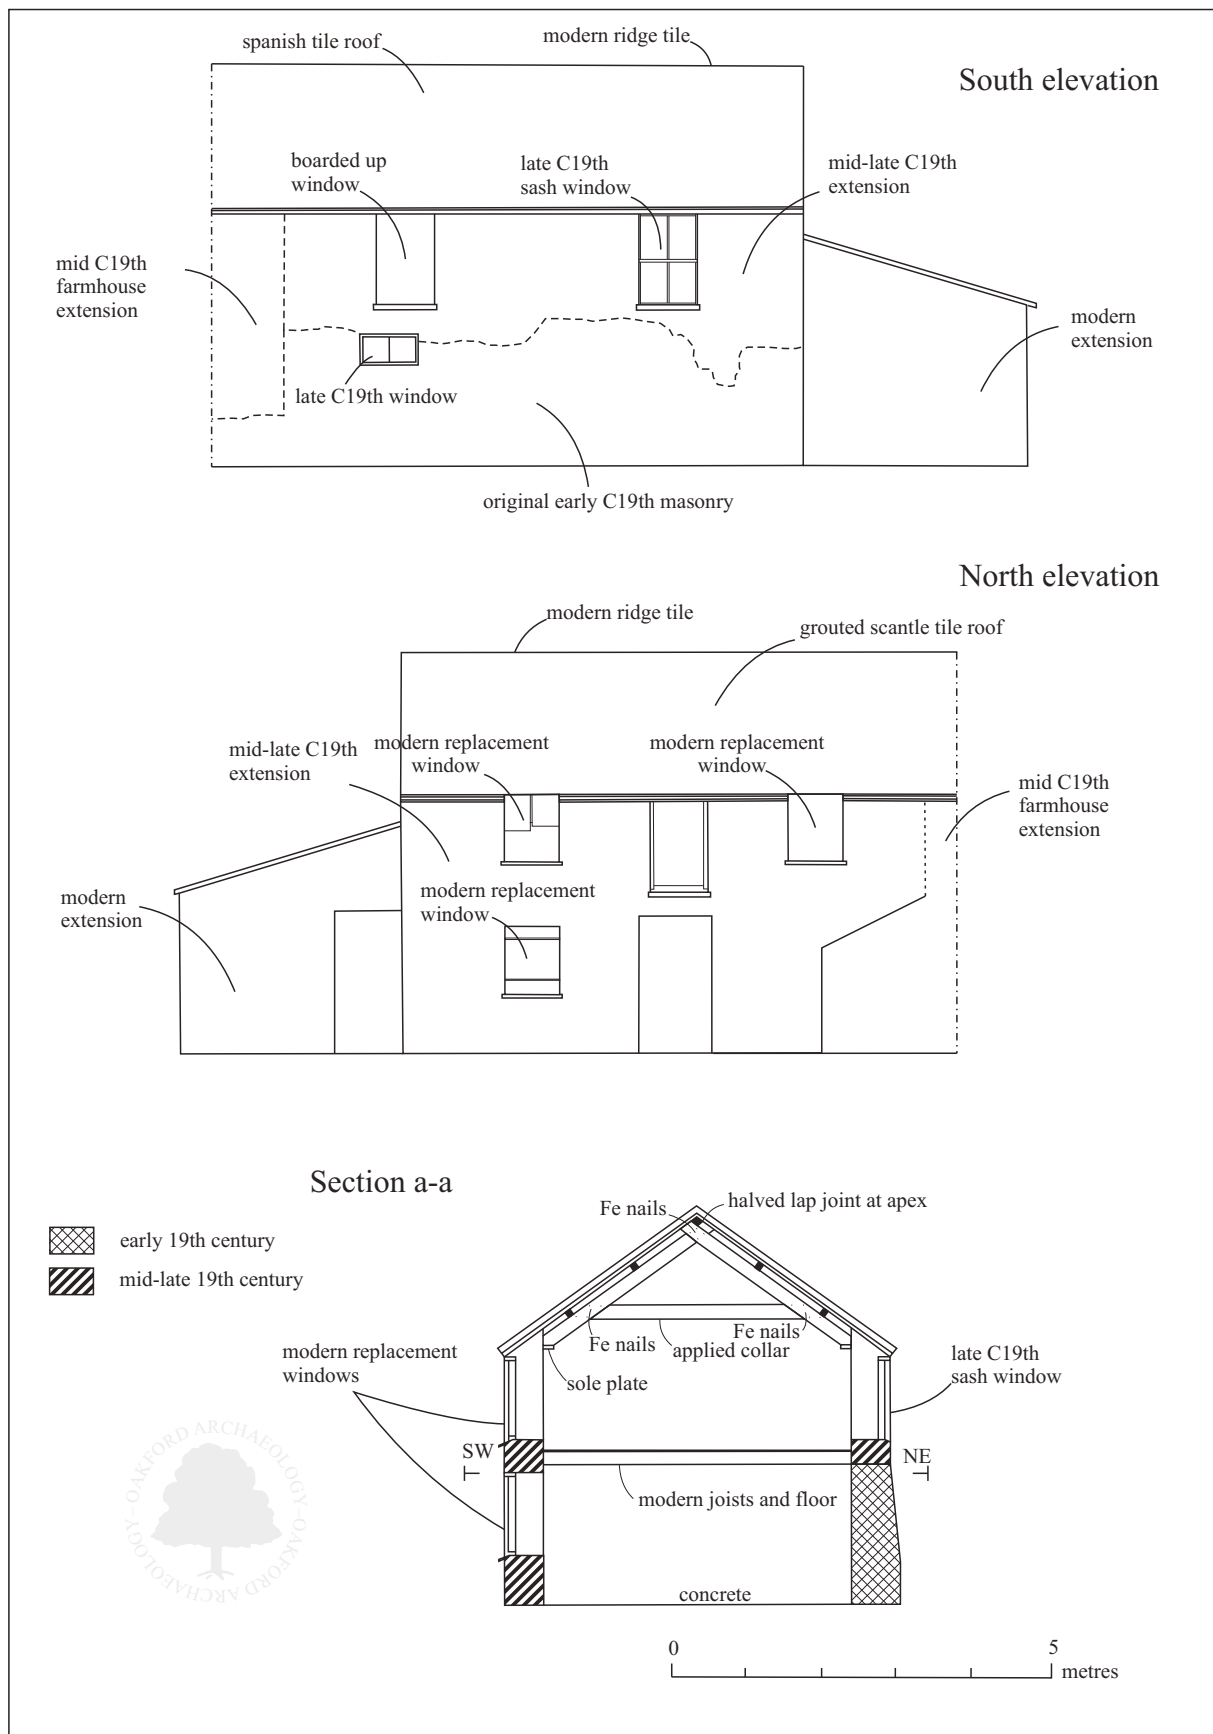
External elevations of the building and section through north part of building showing a typical roof truss.
